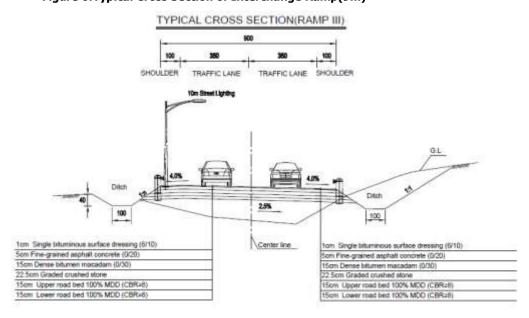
Typical Cross Section of Interchange Ramp(10m)
